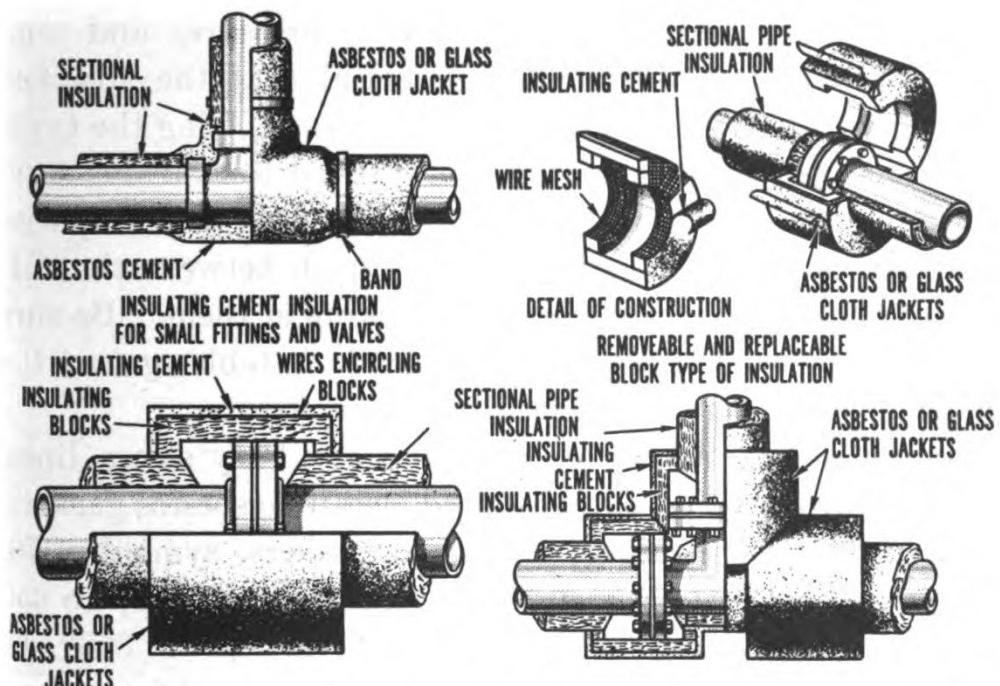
Permanent-type insulation for pipe fittings, flanges, and valves.
